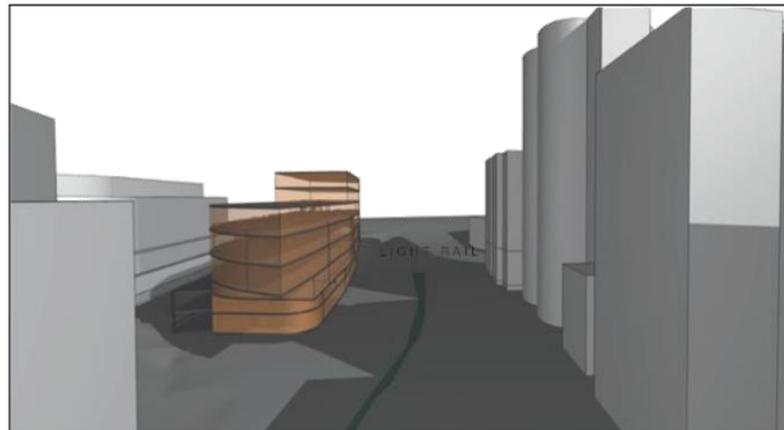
Building Envelope Viewed Light Rail Corridor (Rear)
